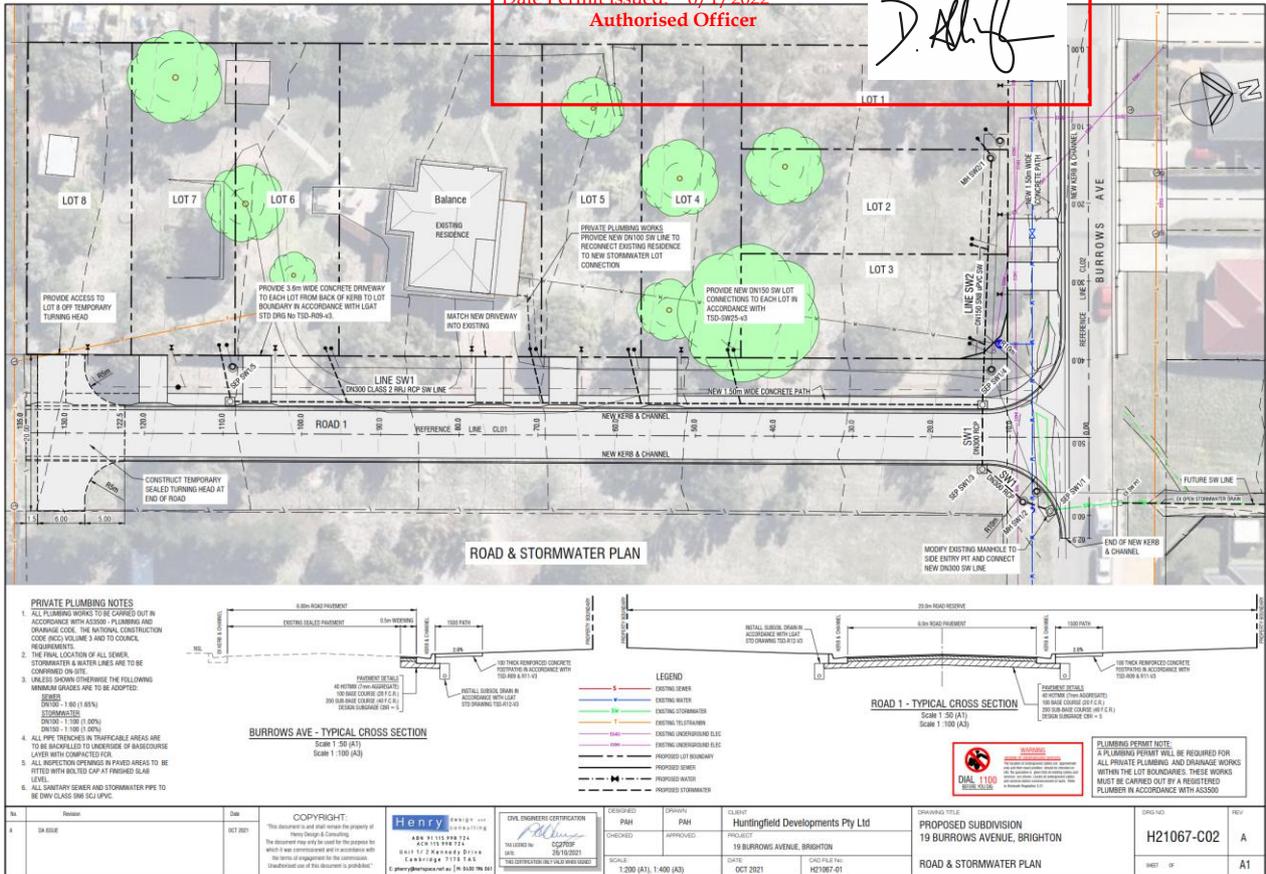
Henry Design & Consulting general arrangement plan (10/21)
